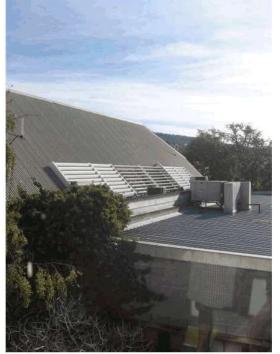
Image of rear roof plane of 5-7 Barrack Street with external louvres. The flat roof is the subject building to be demolished. Photo taken from the rear of the second storey of 83 Davey Street. Source: Council image.
